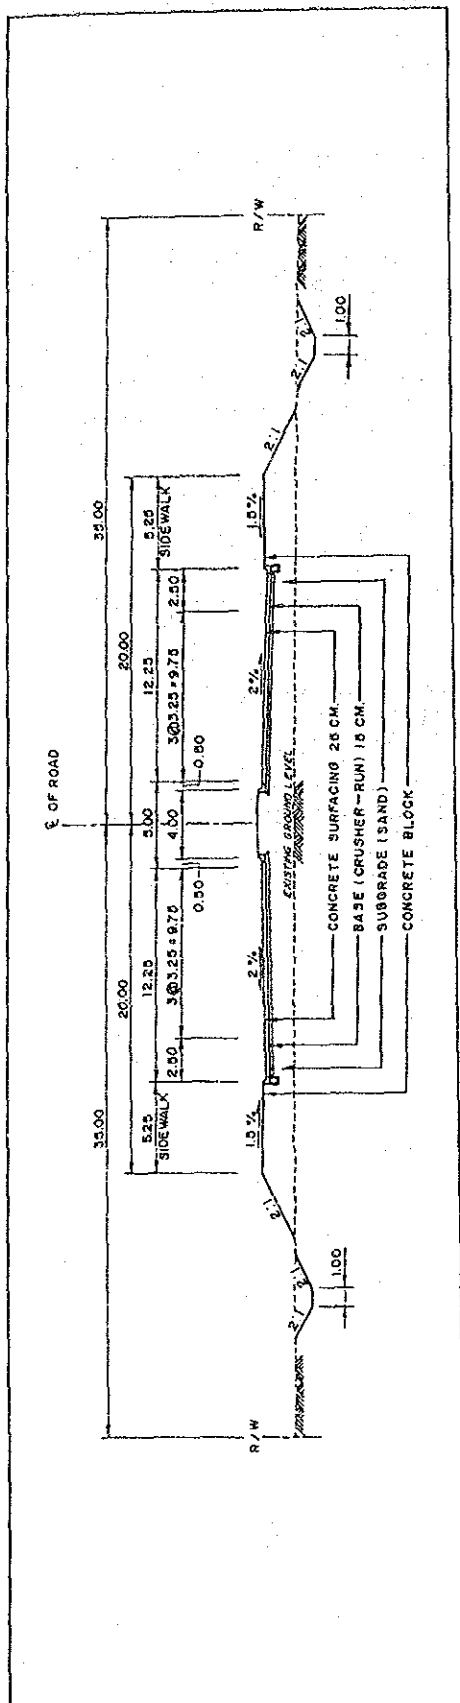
Typical Cross-Section (STA.13 - 19)
